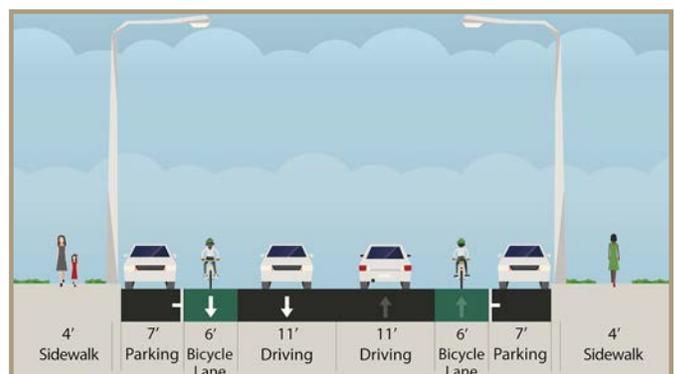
Looking south on Center Street south of Willow Avenue, proposed conditions.
